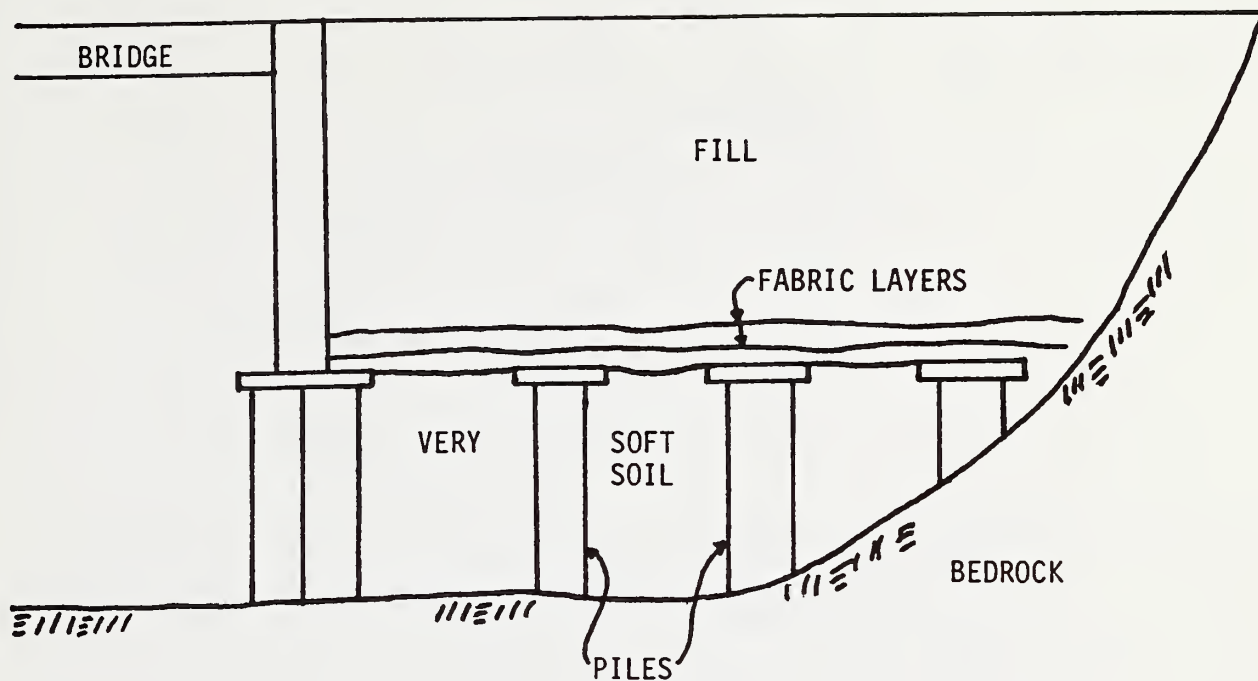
Fabric Reinforced Bridge Abutment.
